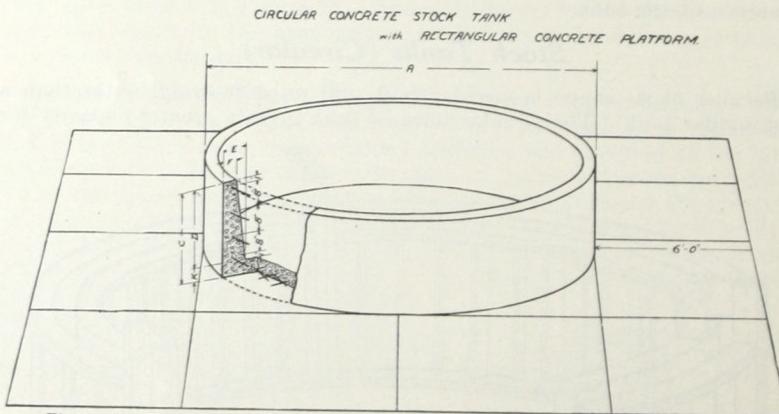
Layout for a Circular Stock Tank with rectangular floor surrounding it.
